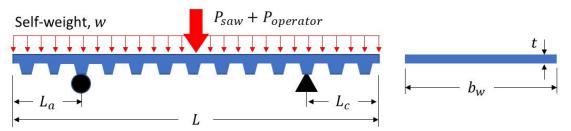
Slab modeled as a beam used for hand calculation of flexural capacity.
